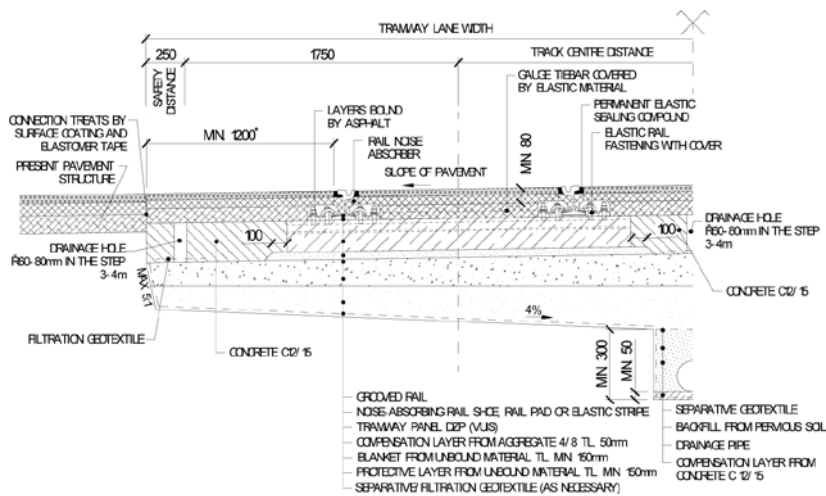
The design of tram track with prefabricated concrete slab without absorbing mat
